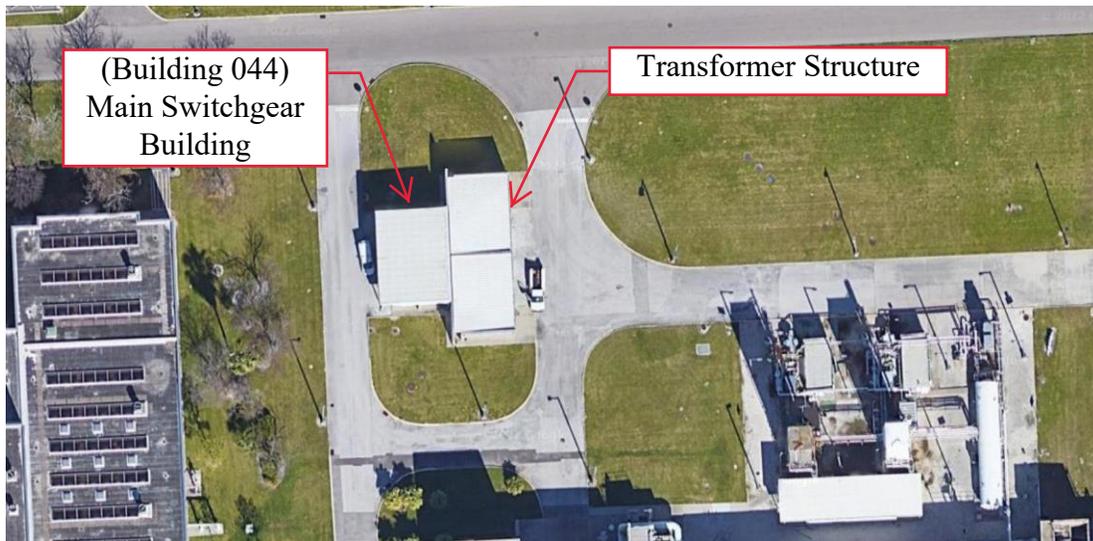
Main Switchgear Building and Transformer Structure Location Site Plan
